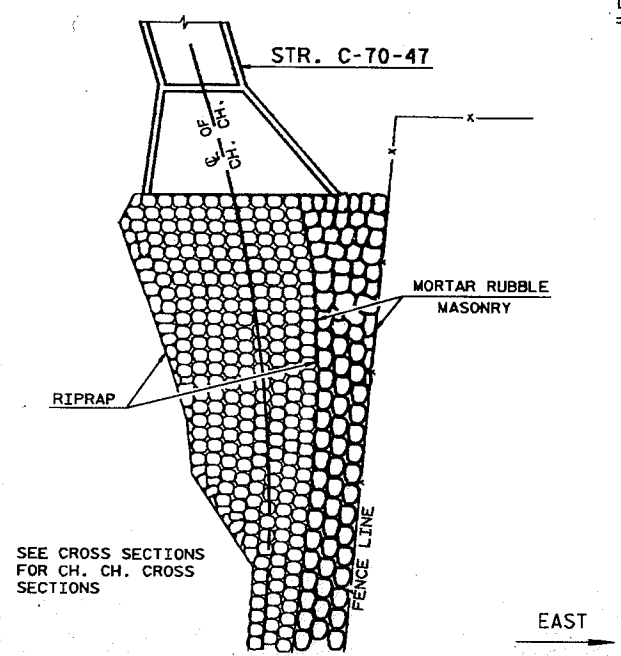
DETAIL FOR CROSS - DRAIN AT STATION 96 + 15
